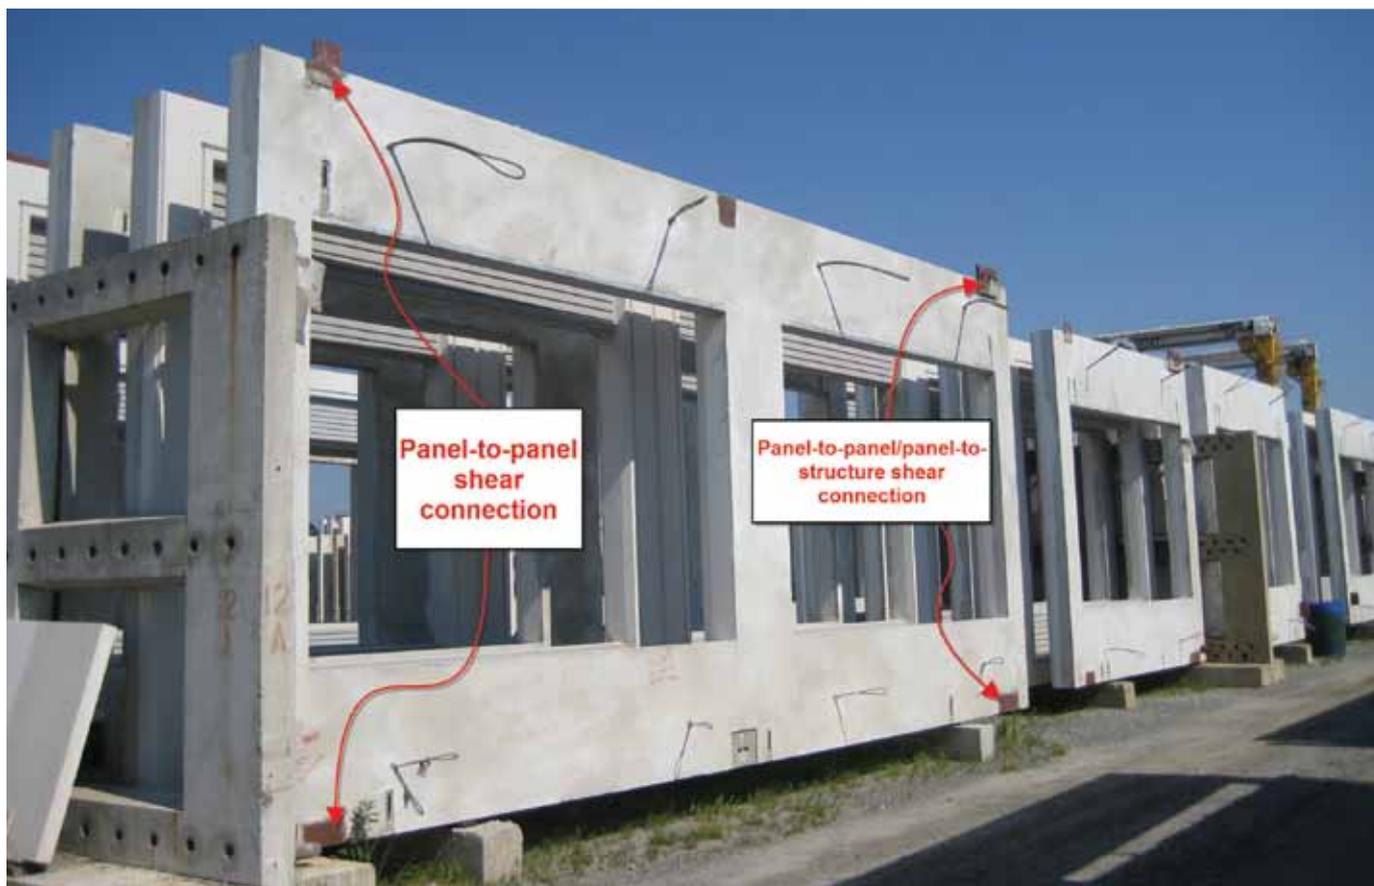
Rear elevation of a typical panel in storage. Figure 5 shows the connection details.
